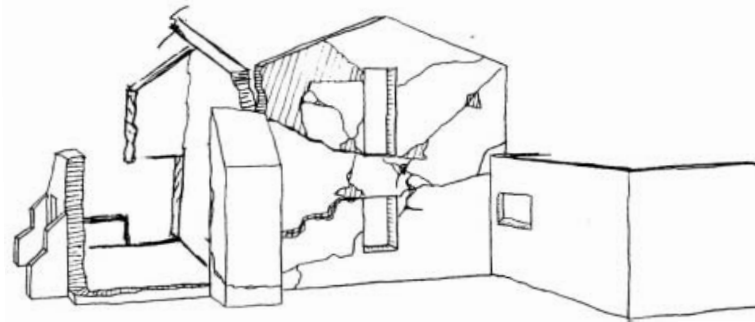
Drawing of damaged gable-end wall on the east end of the south wing.
